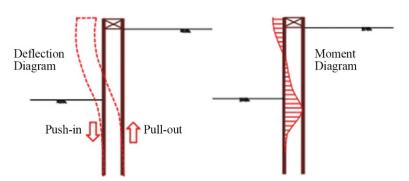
Behavior of Retaining System by Double-layered Sheet Piles
